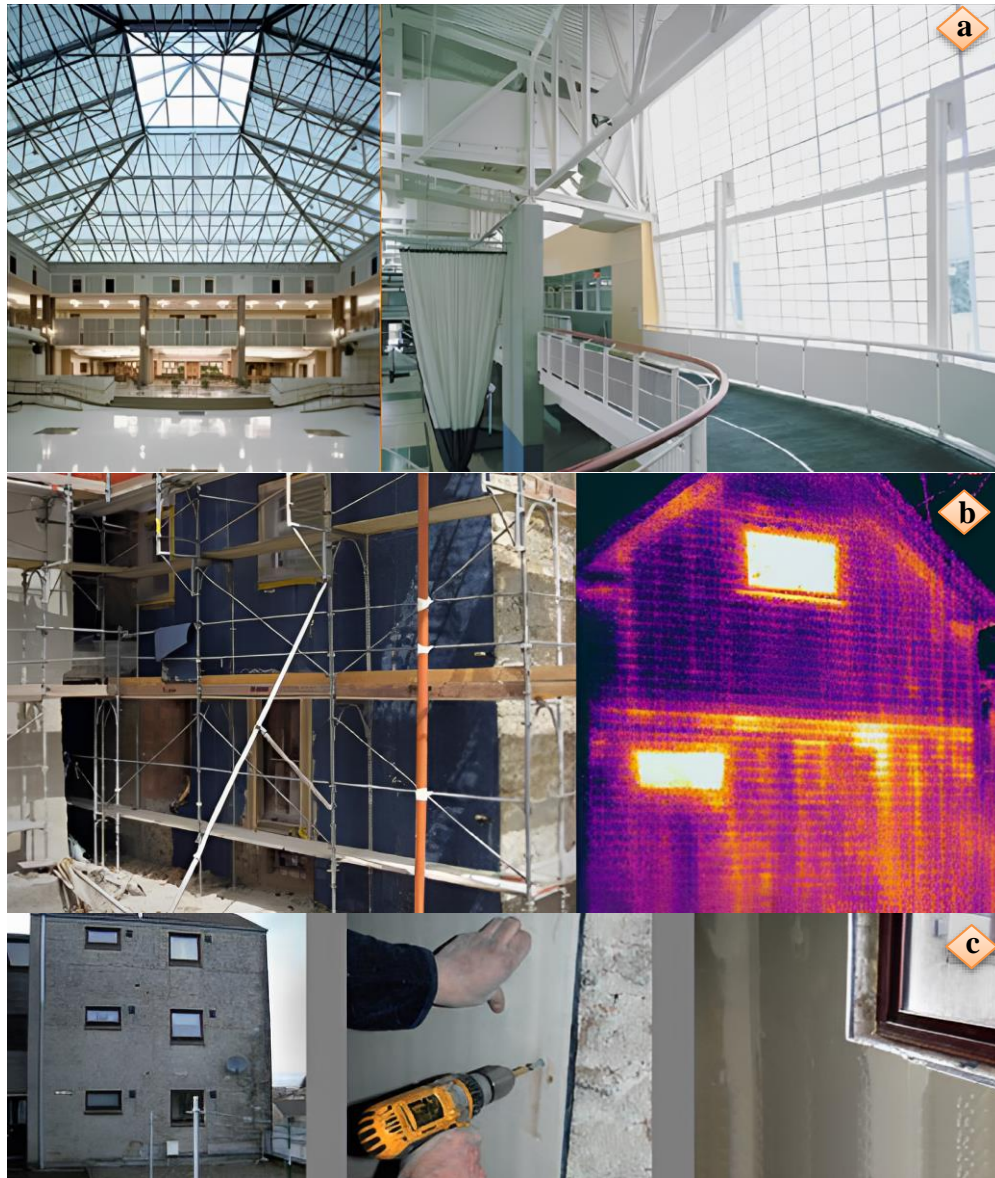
a) Aerogel glazing applications for building roofs and facades, b) aerogel-insulated and non-insulated building facades for heat loss assessment, c) and the first aerogel-insulated building in the UK in 2007 [5].
